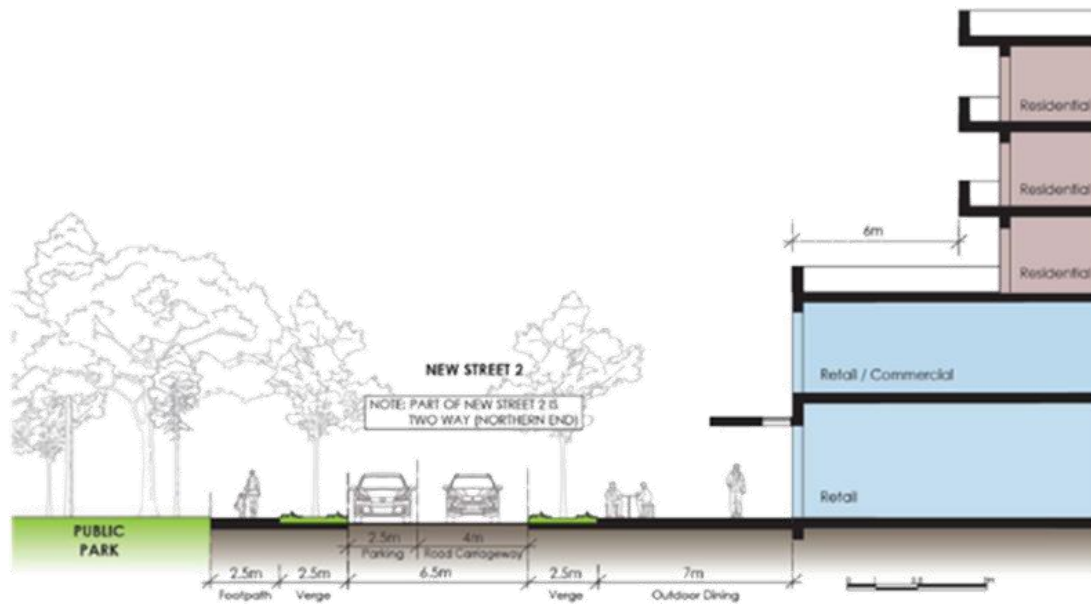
New Street 2 Setbacks - Southern End - Section D-D
